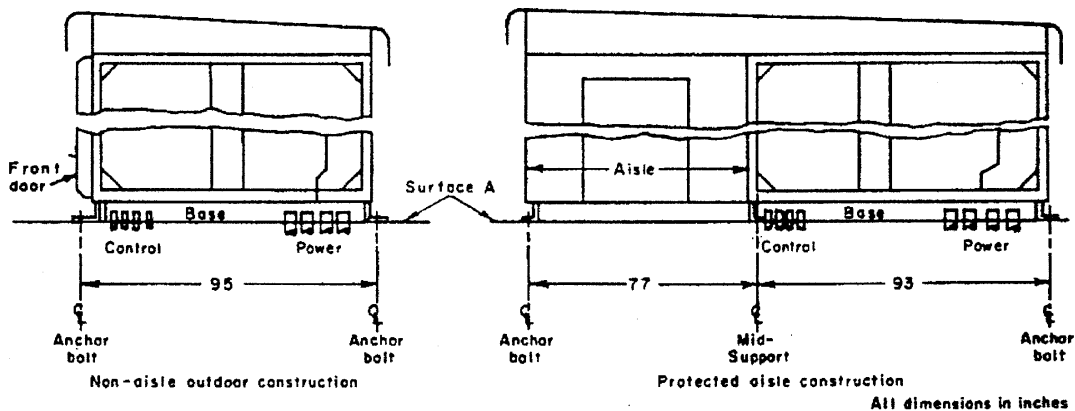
Floor Details for Switchgear with Roll-in Breaker
